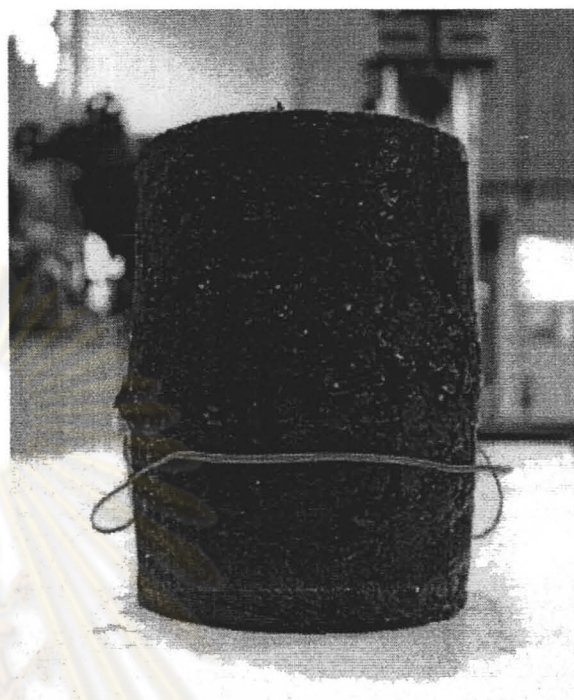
Typical failure mechanism of asphaltic concrete under UC test.
